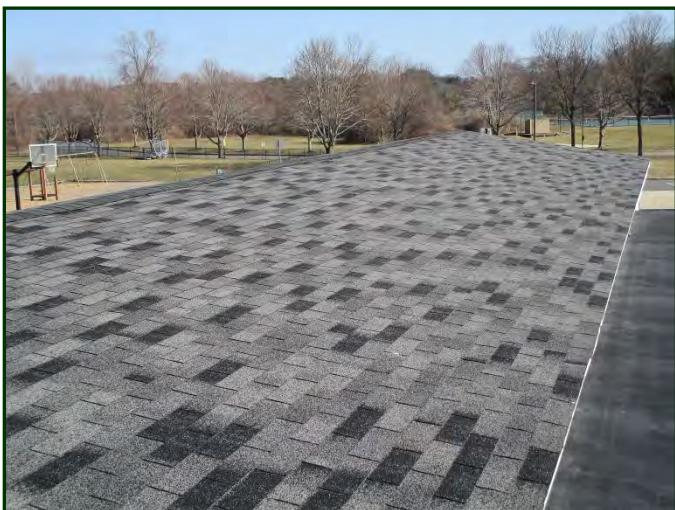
Asphalt composition roof shingles on modular classrooms (circa 1999)
